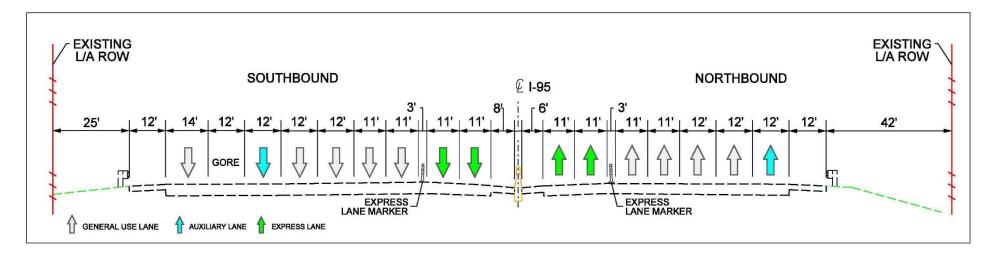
I-95 Existing Roadway Section North of Hallandale Beach Boulevard
